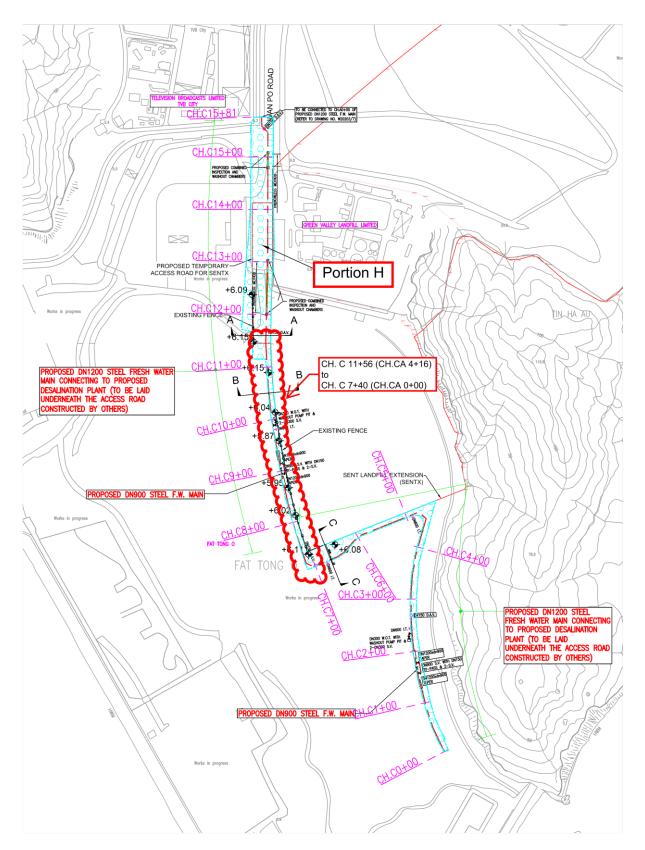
Location Plan for Portion H– CH.C 7+40 (CH.CA 0+00) to CH.C 11+56 (CH.CA 04+16)
